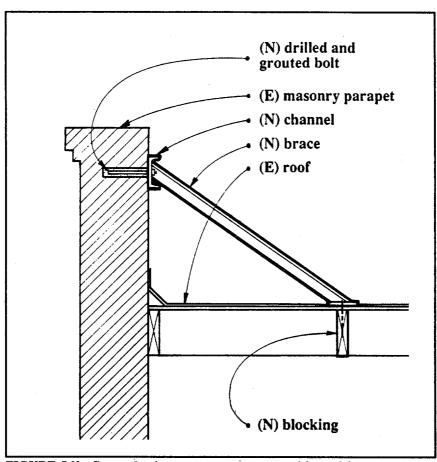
Strengthening a masonry parapet with steel braces.
